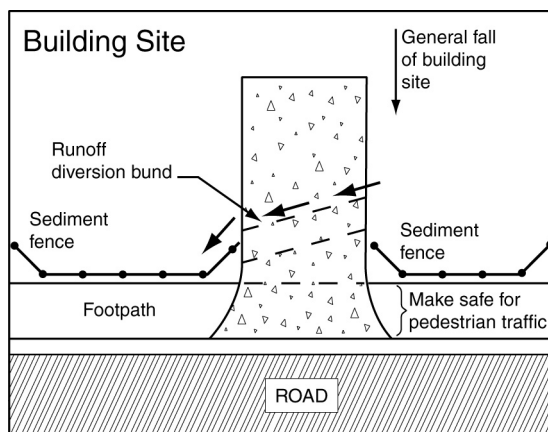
Stormwater runoff being directed off an entry/exit pad
